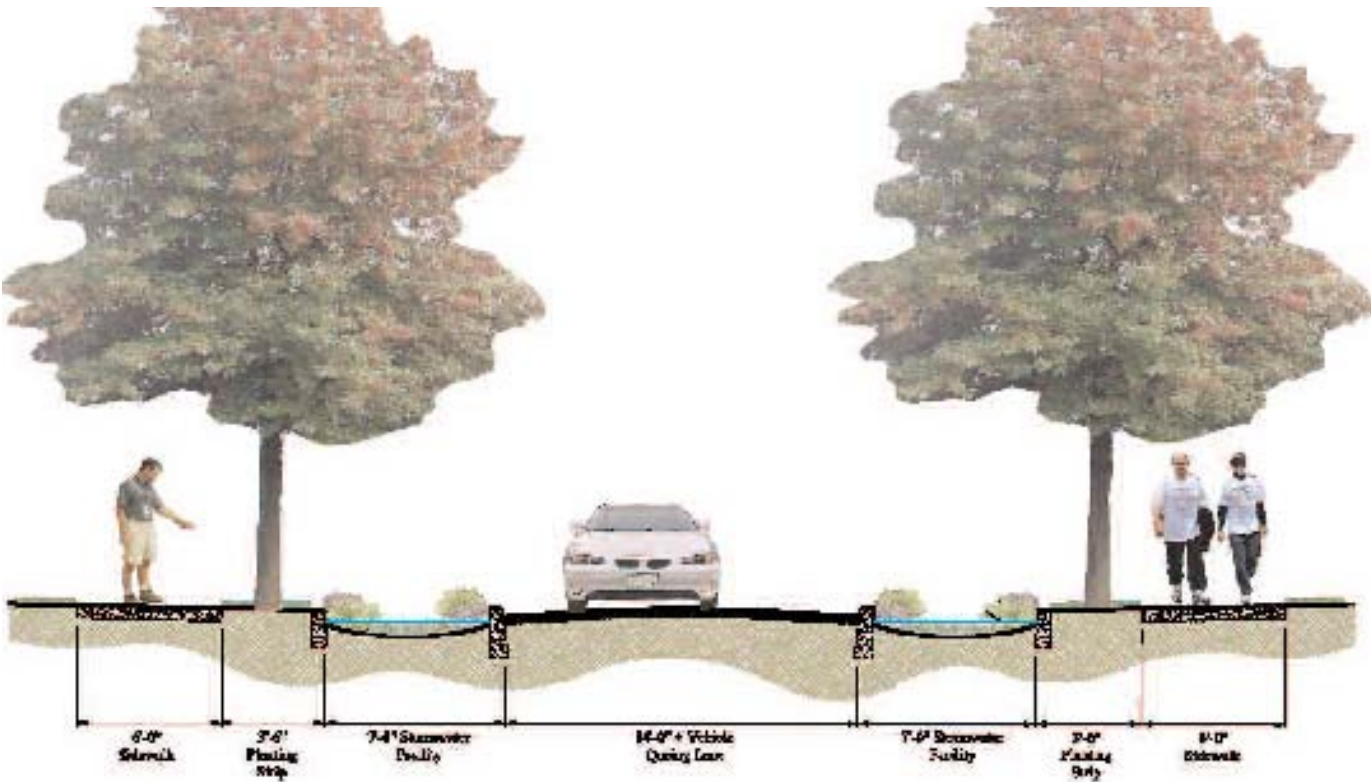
Section cut showing the dimensions of the street through the curb bumpouts
